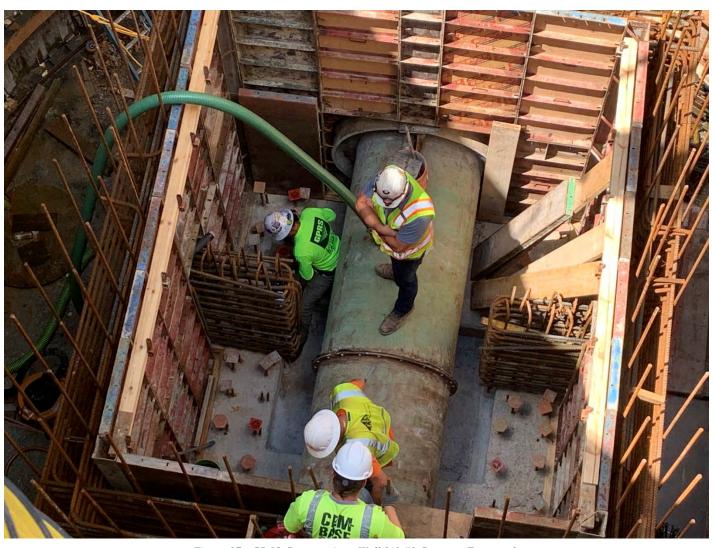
CS-13 Construction - Wall Lift #1 Concrete Formwork
